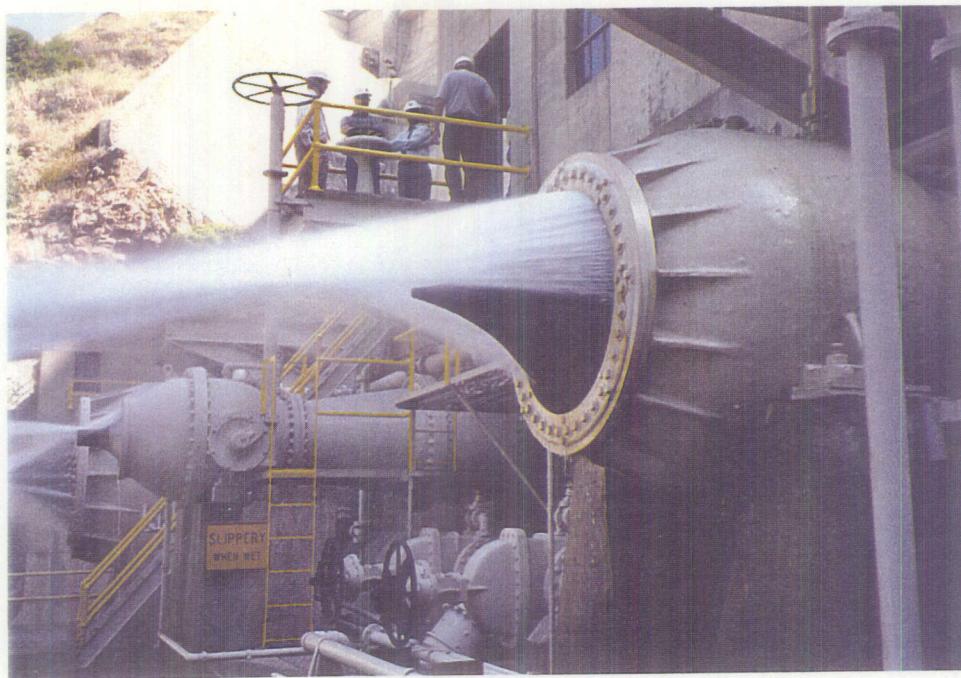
Morris Dam - Needle Valve 3 - View showing needle valve body and leakage at full head. 07/01/98
